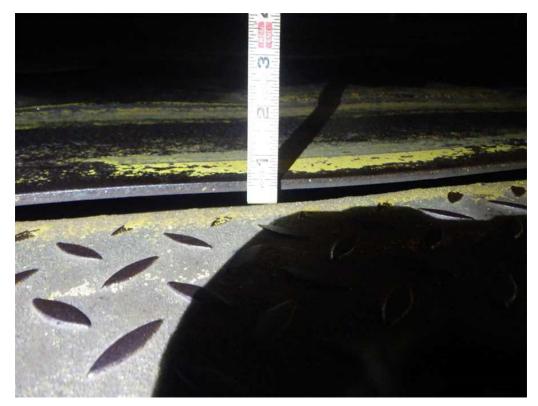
Span 4, Roadway Deck Panel between T4 and T5, 6th Panel (Middle Panel) from East Curb, Looking West - Panel is 1/2" higher than adjacent panel to east.
